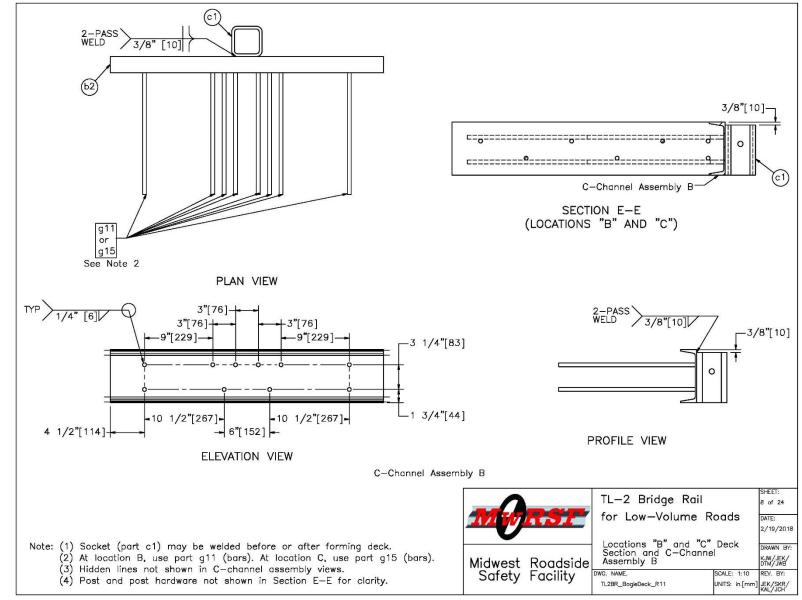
Bogie Testing Matrix and Setup, Locations "B" and "C" Deck Section and C-Channel Assembly B
